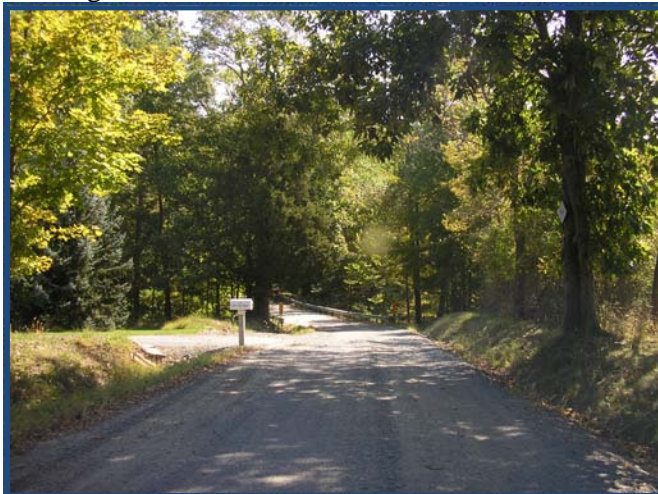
Pine Hill Road – dirt/gravel surface draining into Wickecheoke Creek and Plum Brook.
